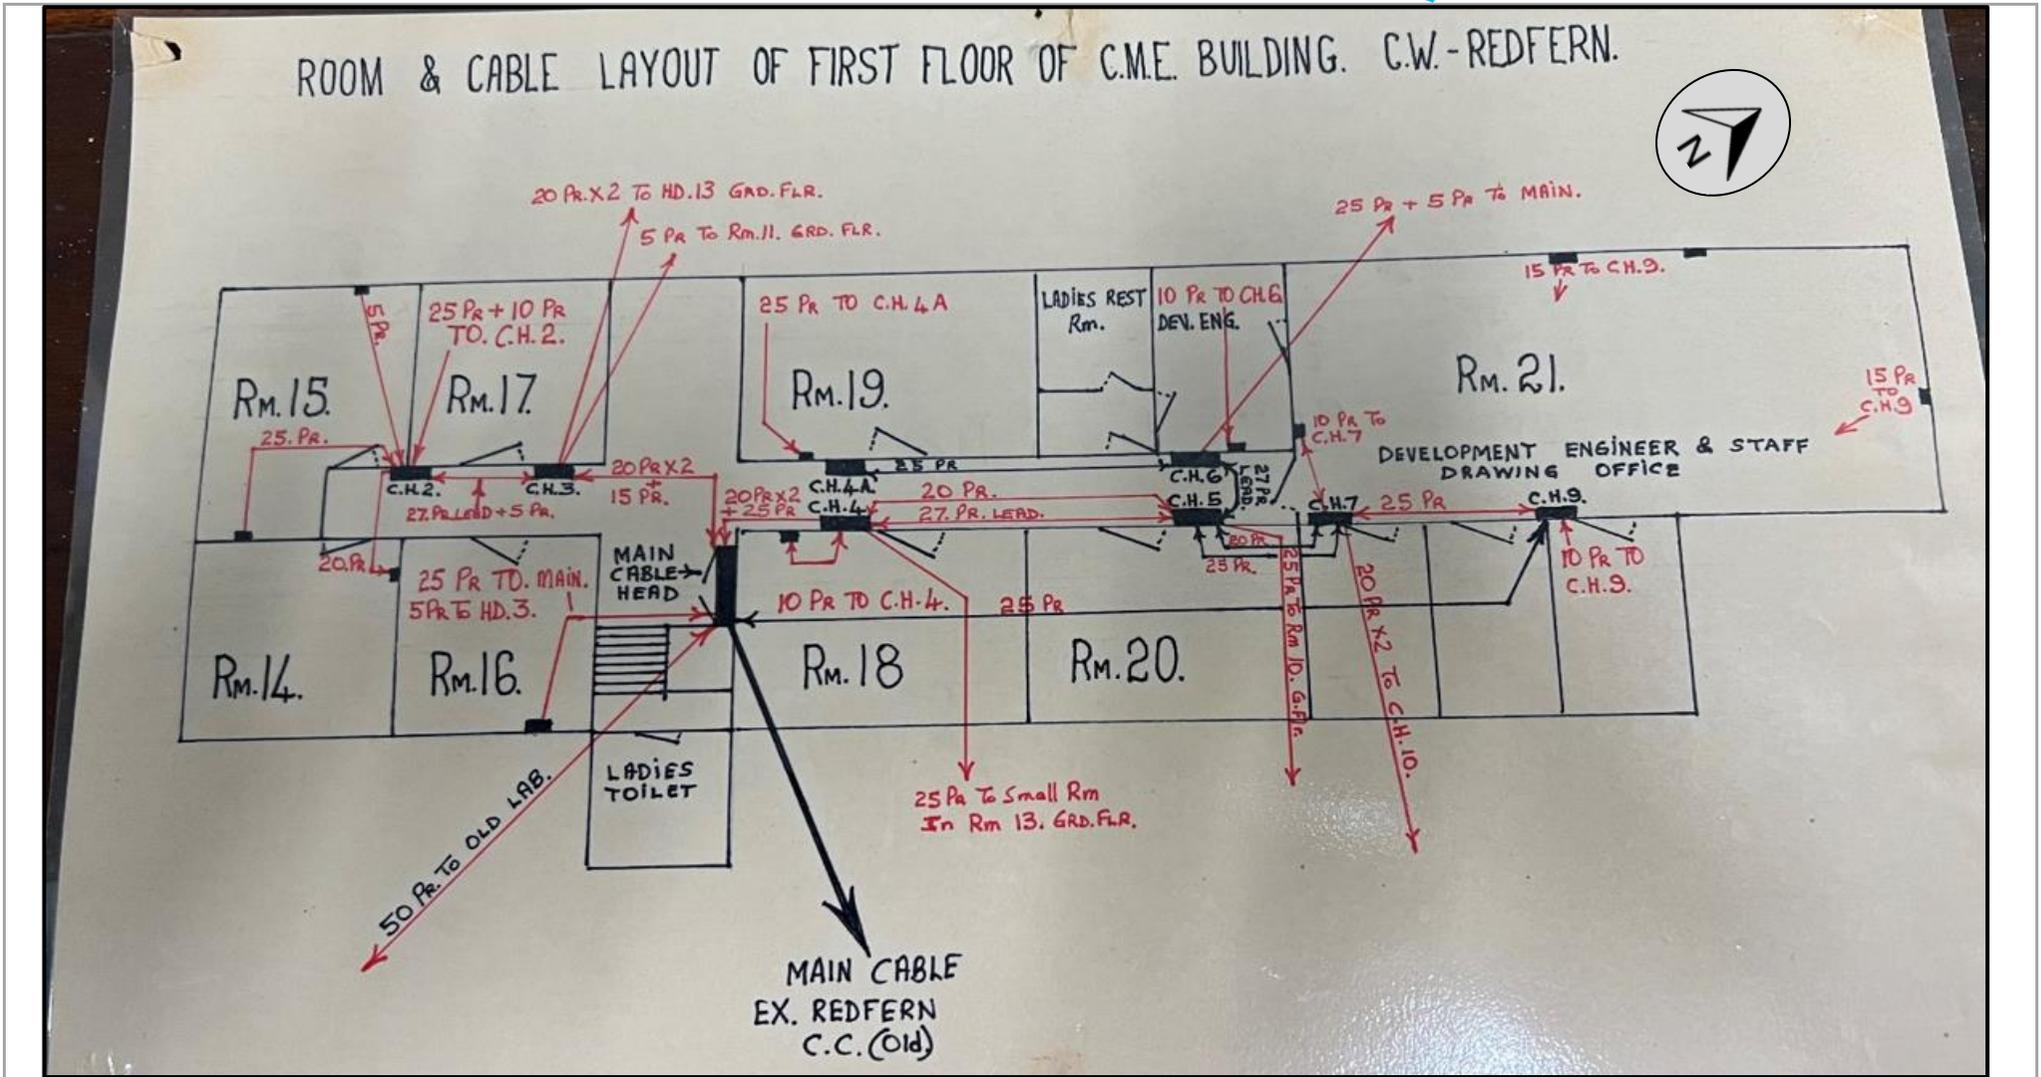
First floor site plan at 505 Wilson Street, North Eveleigh NSW.
